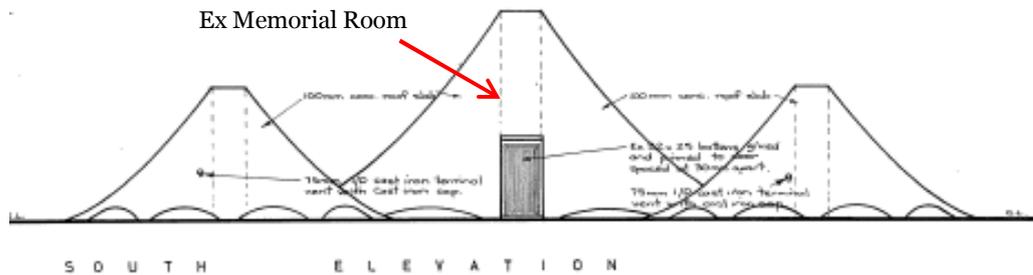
South elevation of the Ex Memorial Room and public toilets.
